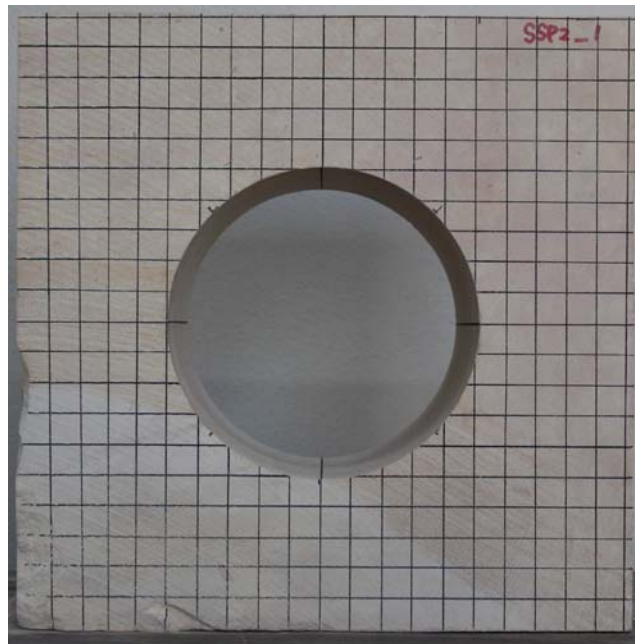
Typical tunnel and pillar geometry tested (grid size 20 mm x 20 mm).
